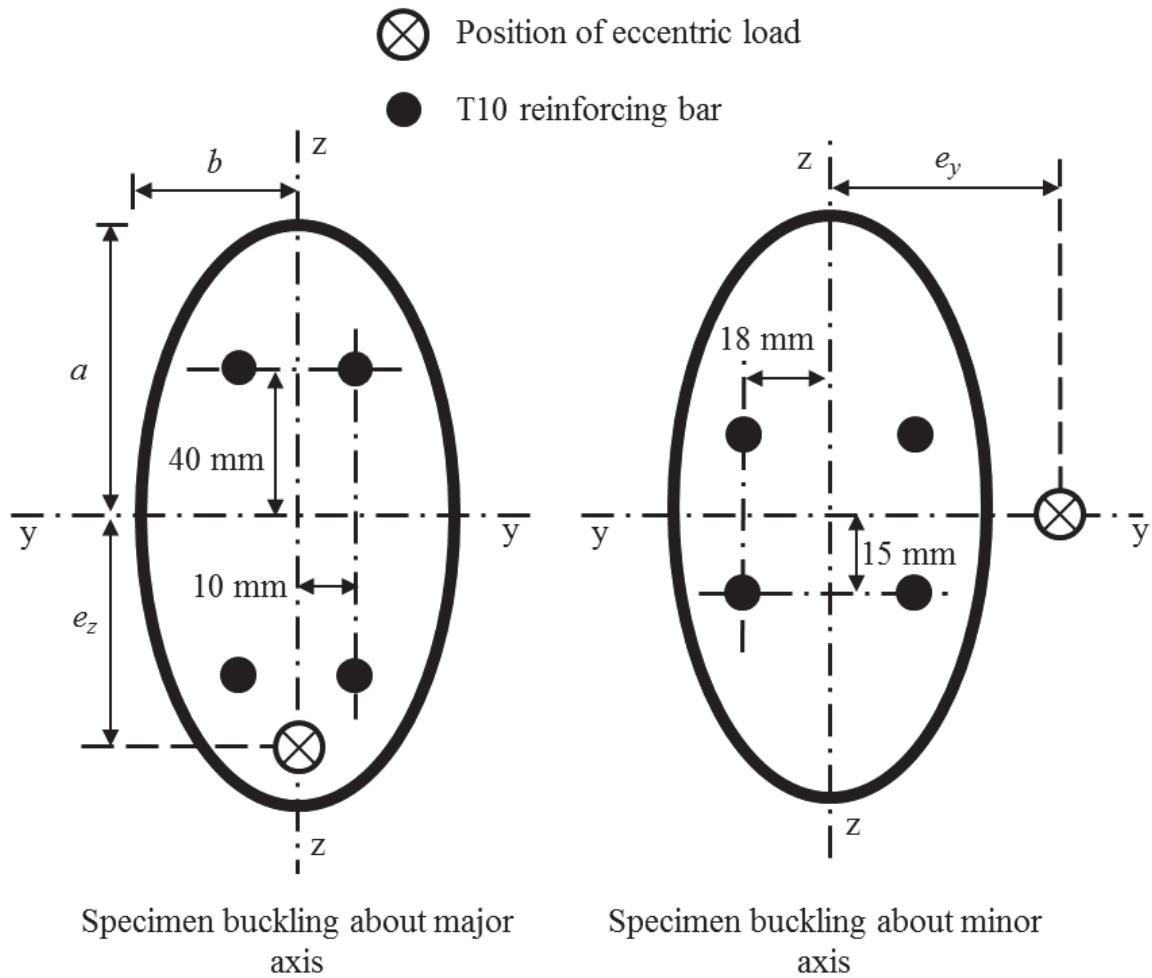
Cross-sectional geometry of CFEHS tests specimens with reinforcement and eccentric load positions
